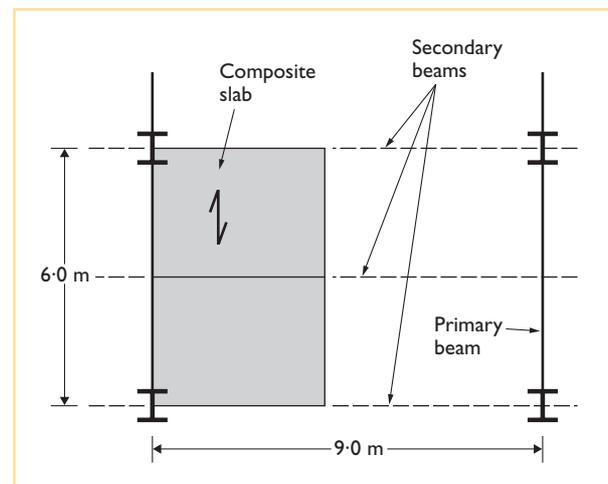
A typical layout for primary and secondary beams. ©The Steel Construction Institute (SCI). See also Figure 11, page 16.
